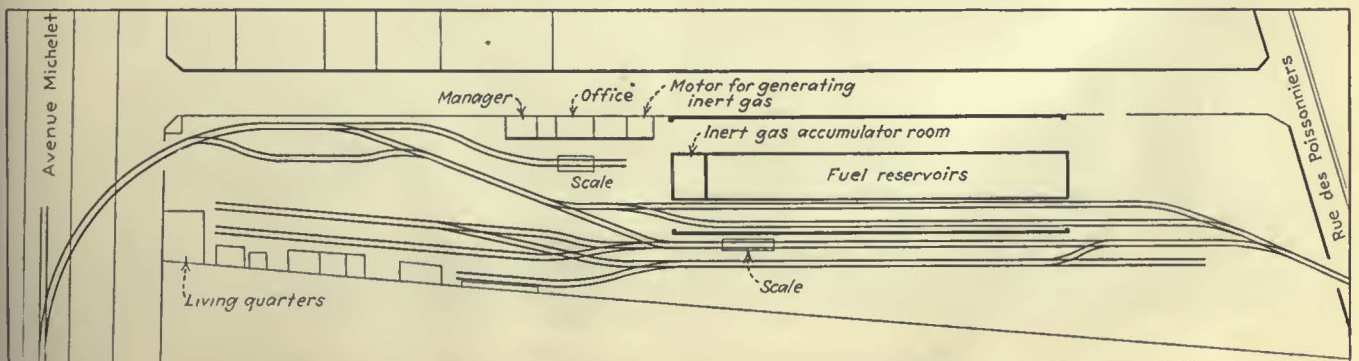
Plan of central storage area showing position of buildings and switch tracks
